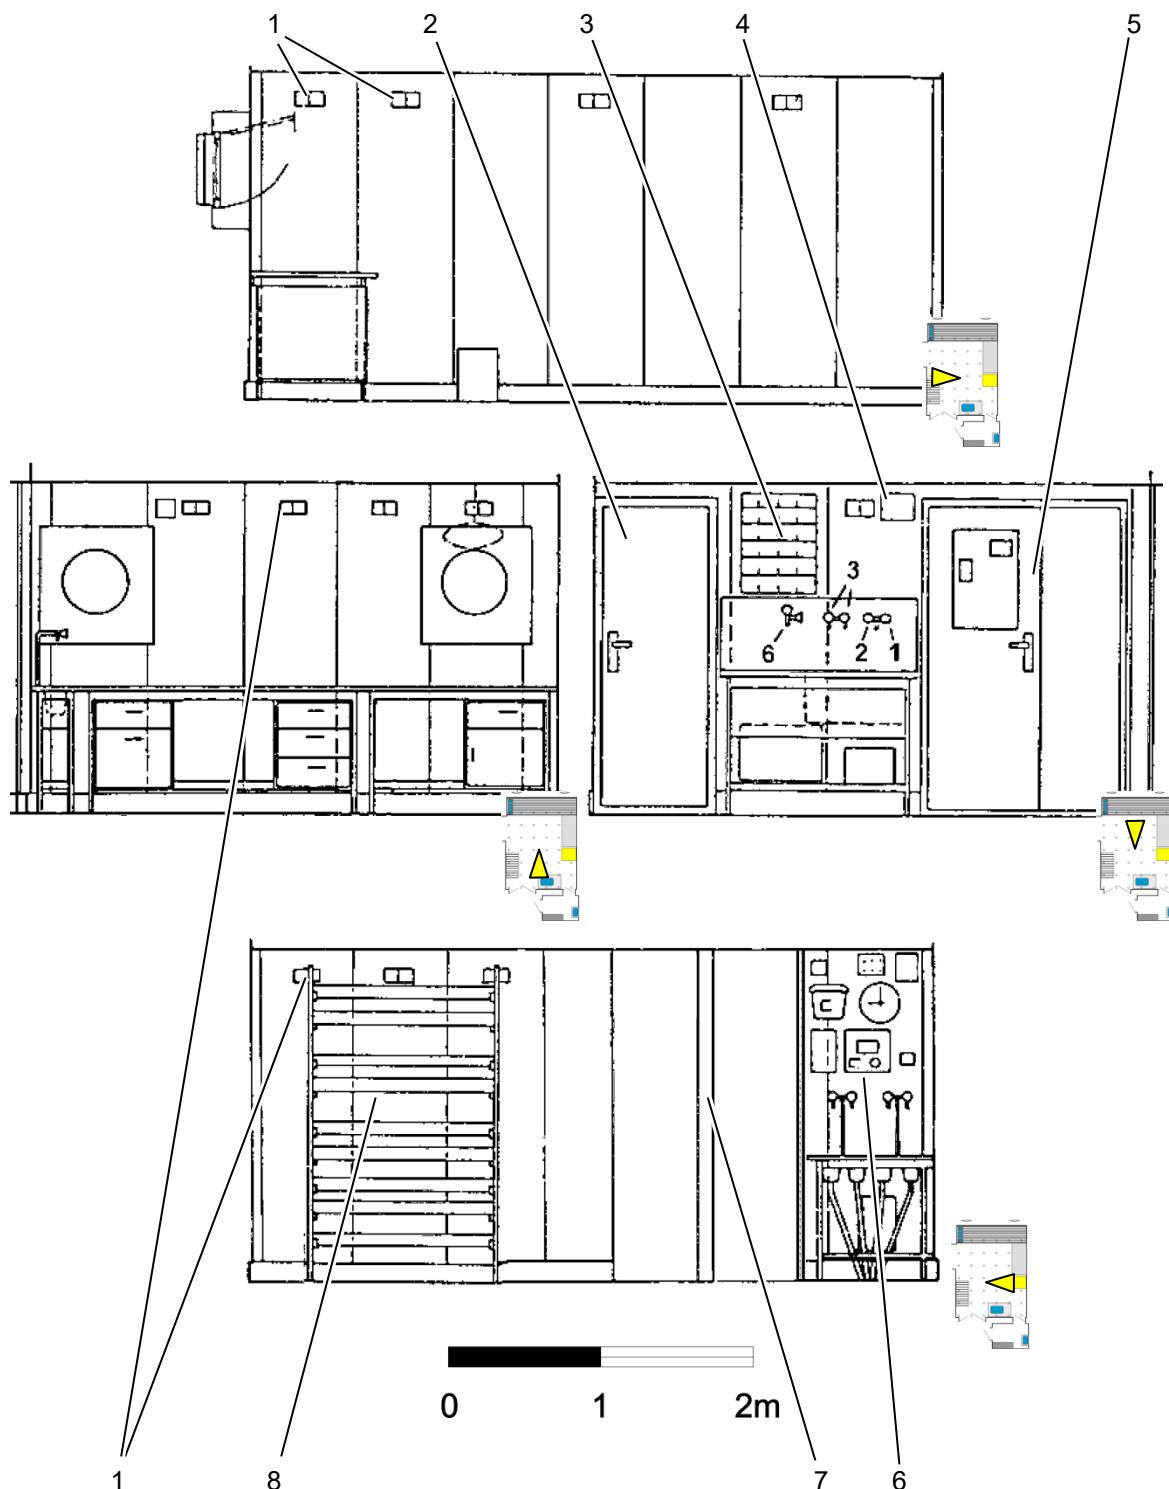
Clean laboratory 4 (detailed plan laboratory walls, status 1986)
